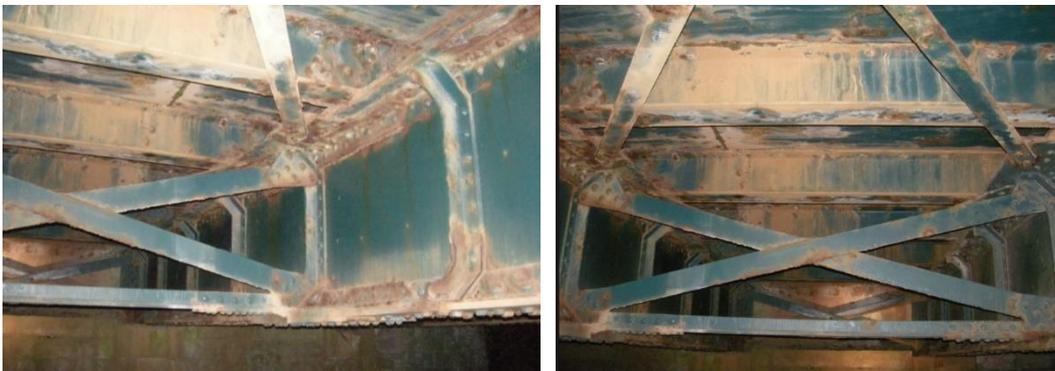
Intermediate pier diaphragm with plan bracing (source: Iarnród Éireann)
